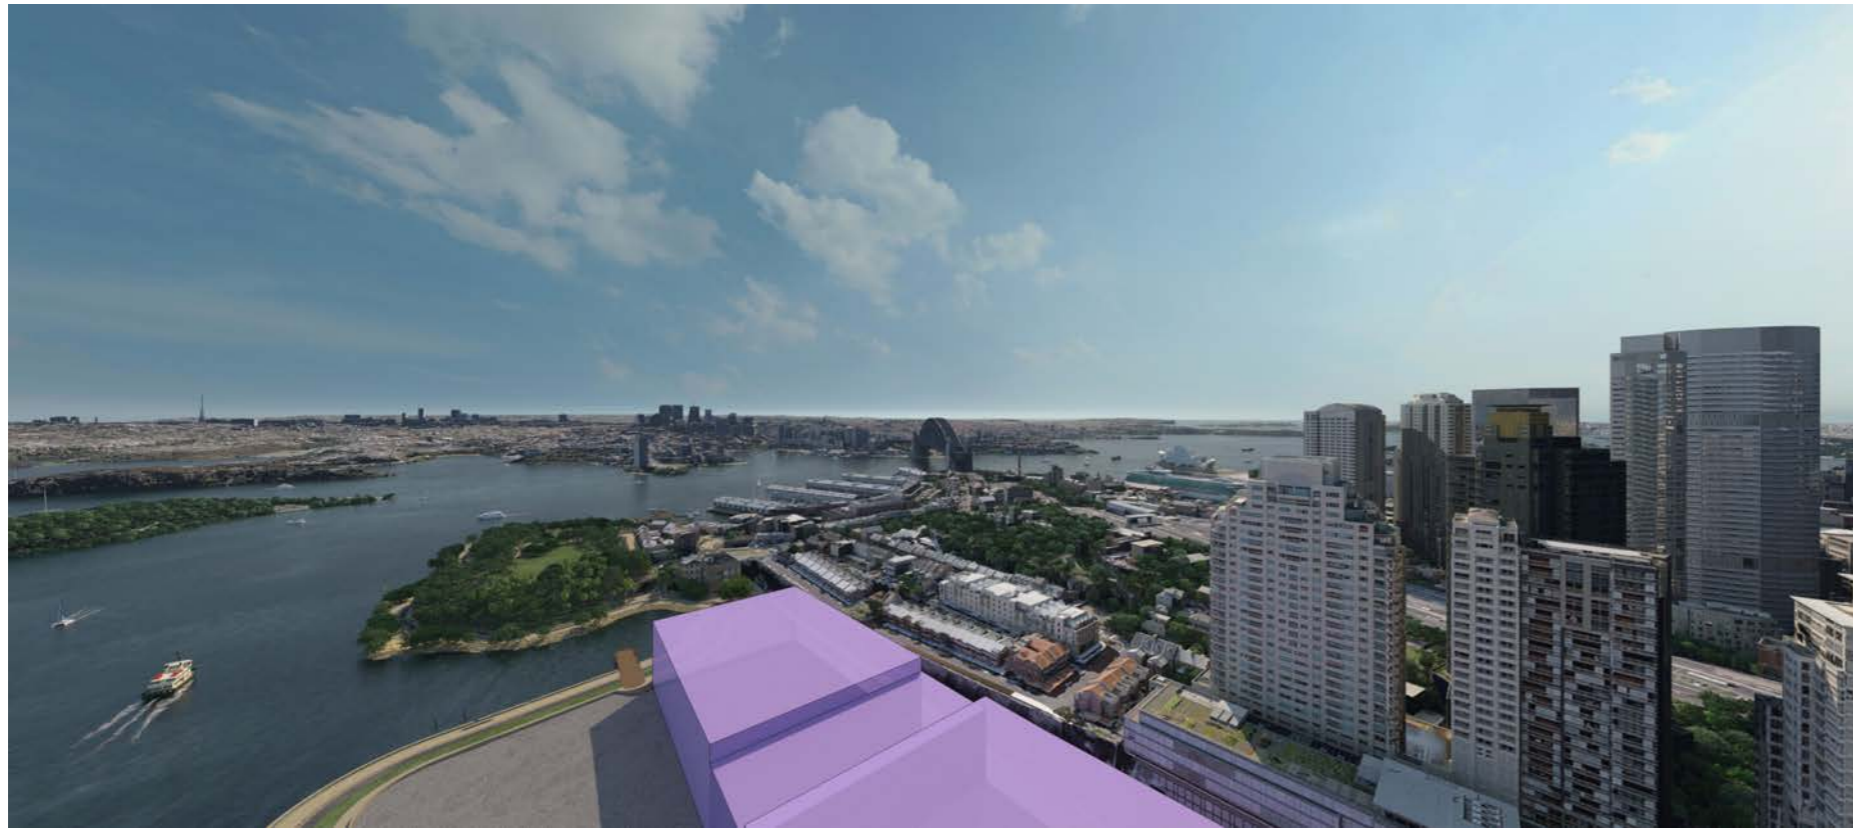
Before view with the Approved Concept Plan (Source: Arterra Interactive, March 2021)
